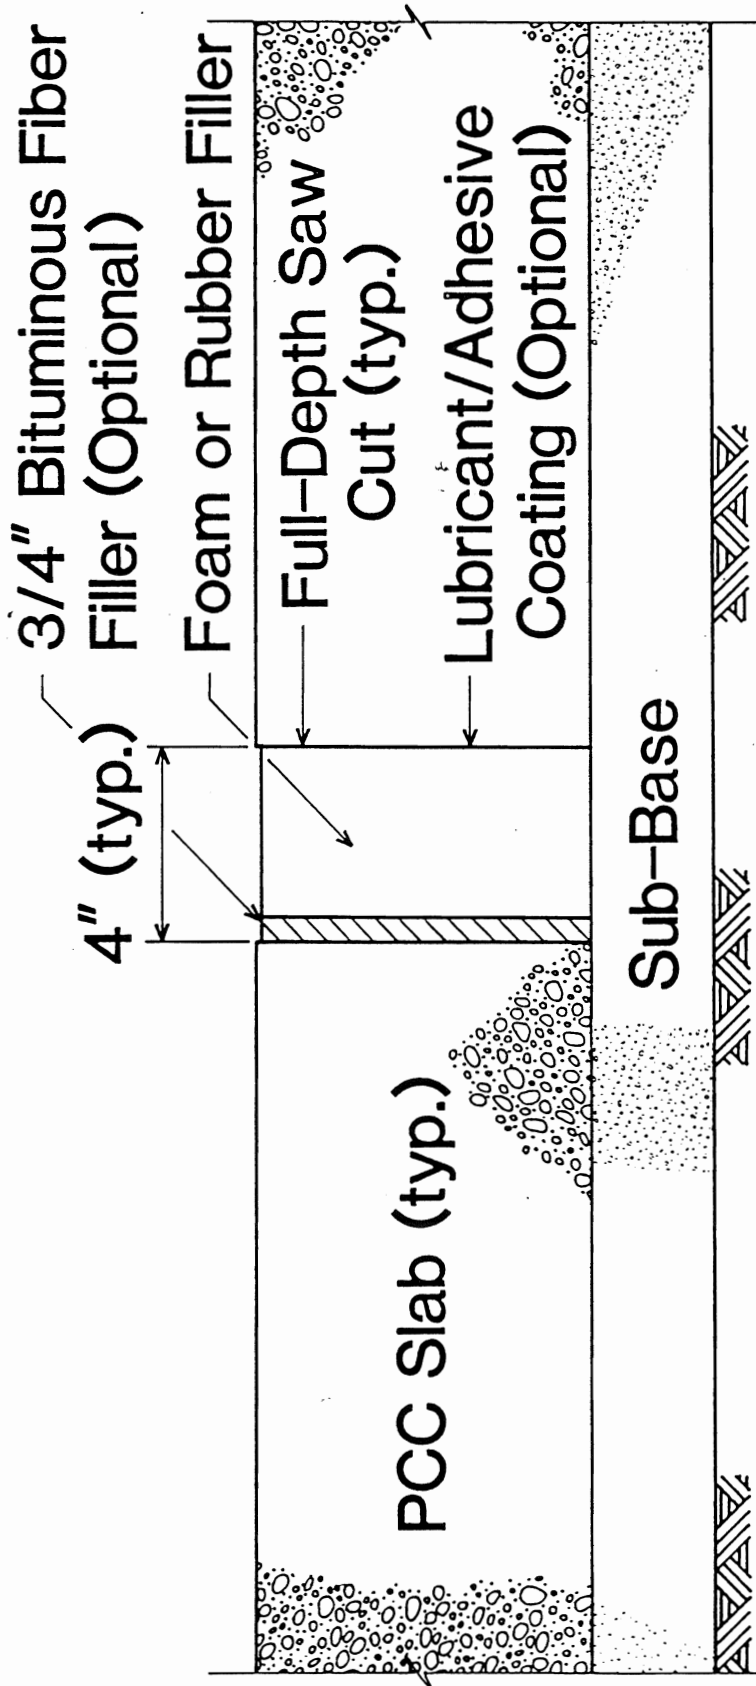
Cross-Section of a Typical Nonbituminous-Filled Relief Joint Without Load Transfer.
